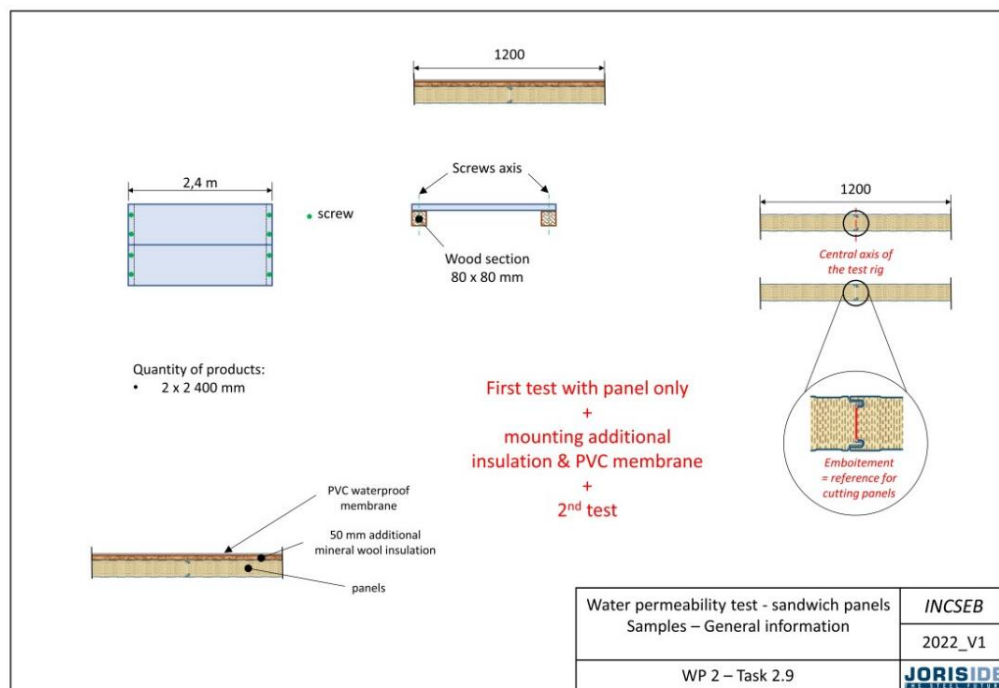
Example of drawings for water permeability tests flat roofing samples and mounting instructions
